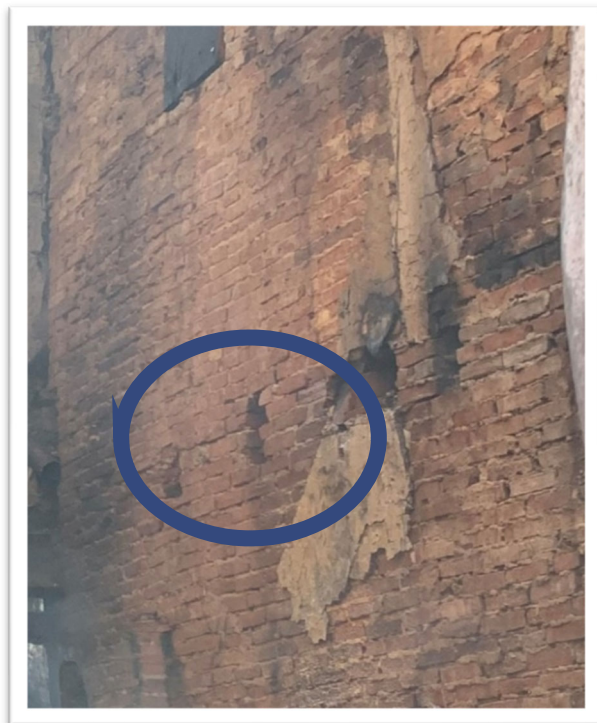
Example of fire cut from 205 S. Stricker Street (FIB)
